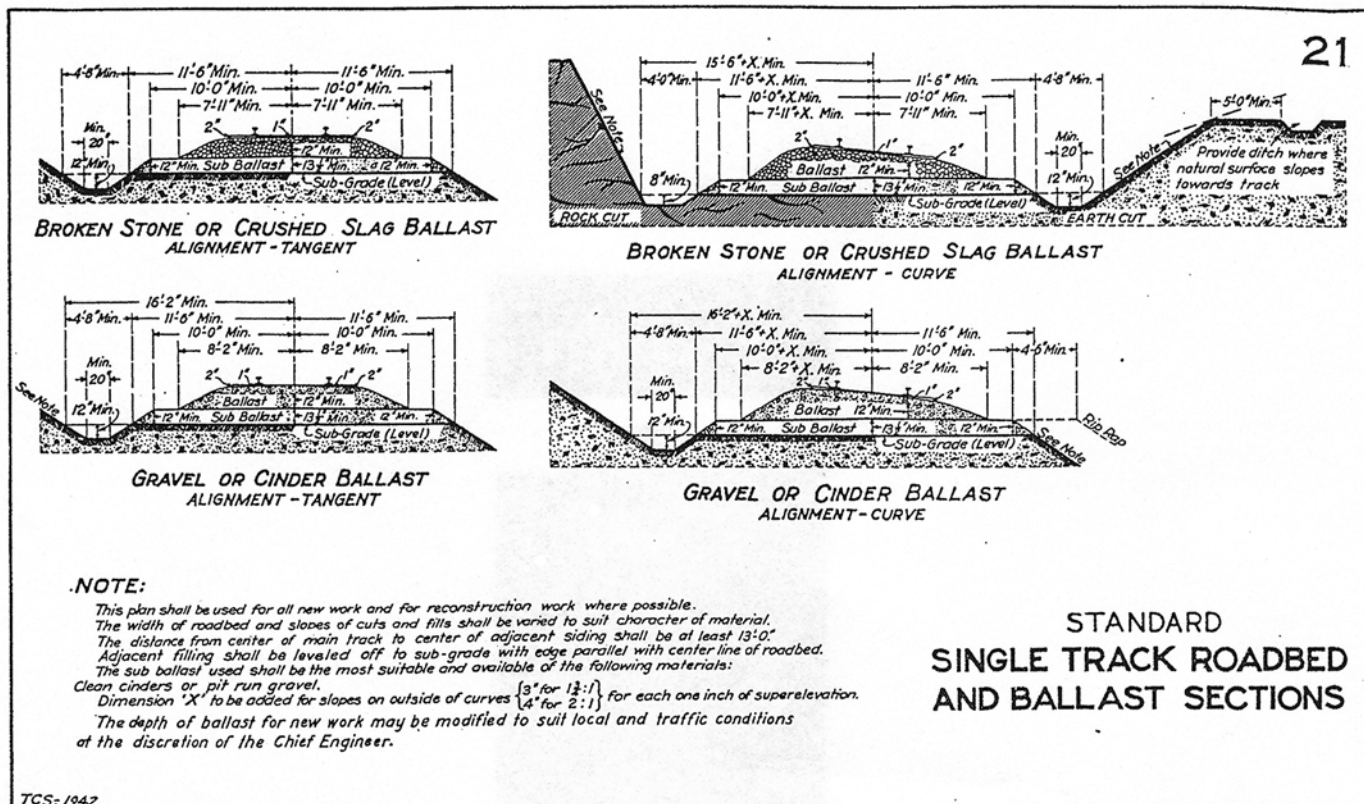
Prototype plans. This cross-section of a typical railroad right-of-way shows the foot of rock ballast as well as the slope and width of the subgrade and ditches. This diagram is from a New York Central engineering book.
